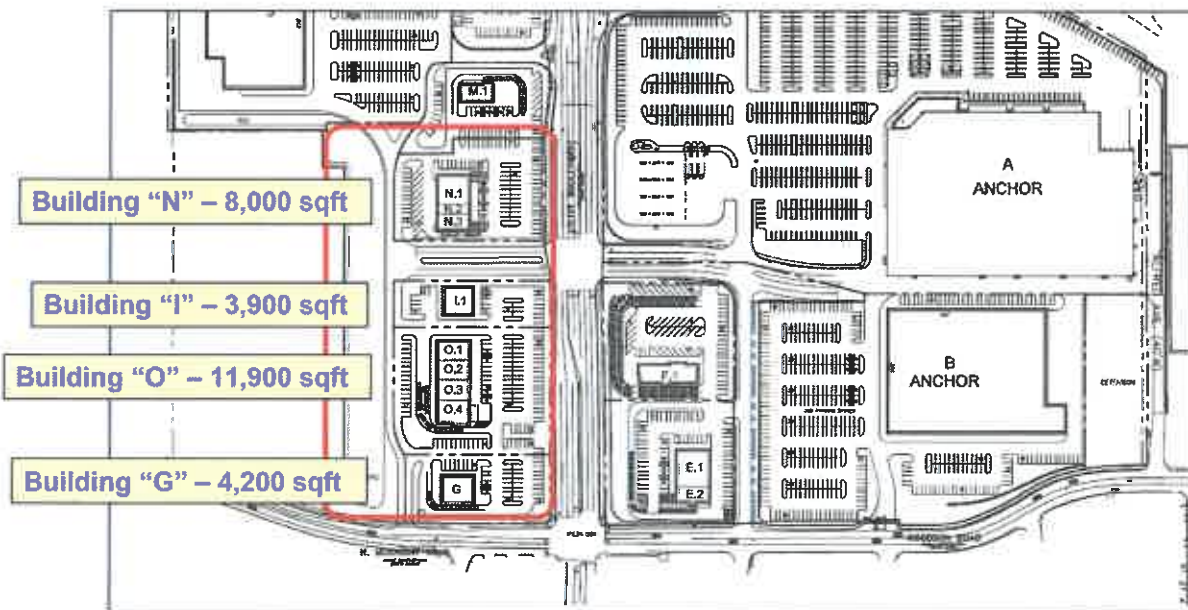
Proposed building sizes for development at the southwest corner of Olive Boulevard and McKnight Road.
